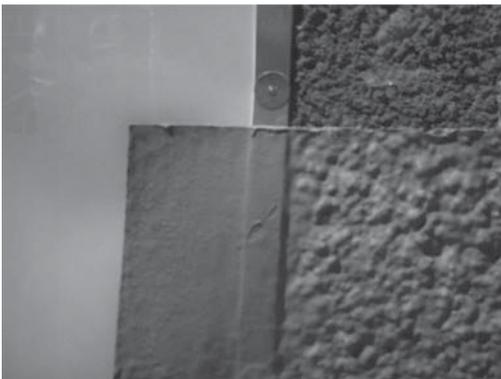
Interface detail between traditional type waterproofing and fully bonded spray applied membranes.
